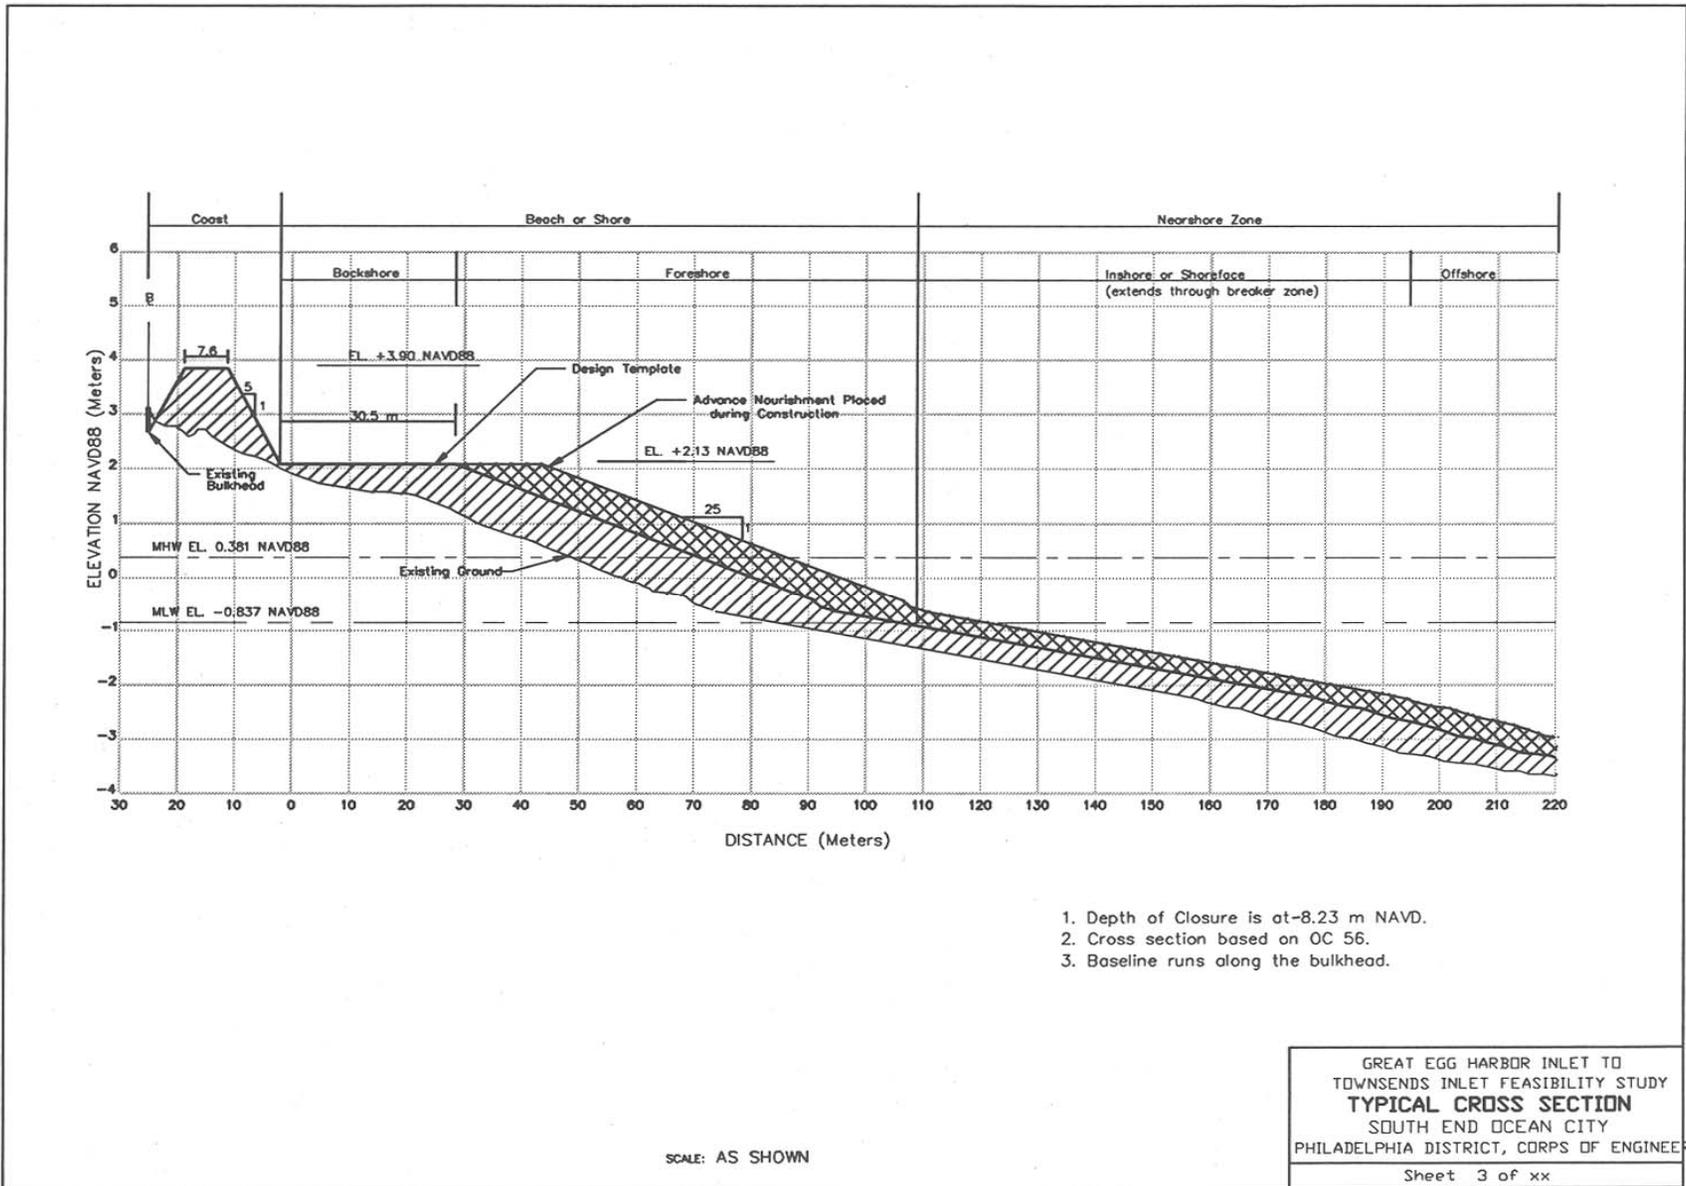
Selected Plan for Ocean City, NJ - Typical Design Cross Section, 34th -59th Street
